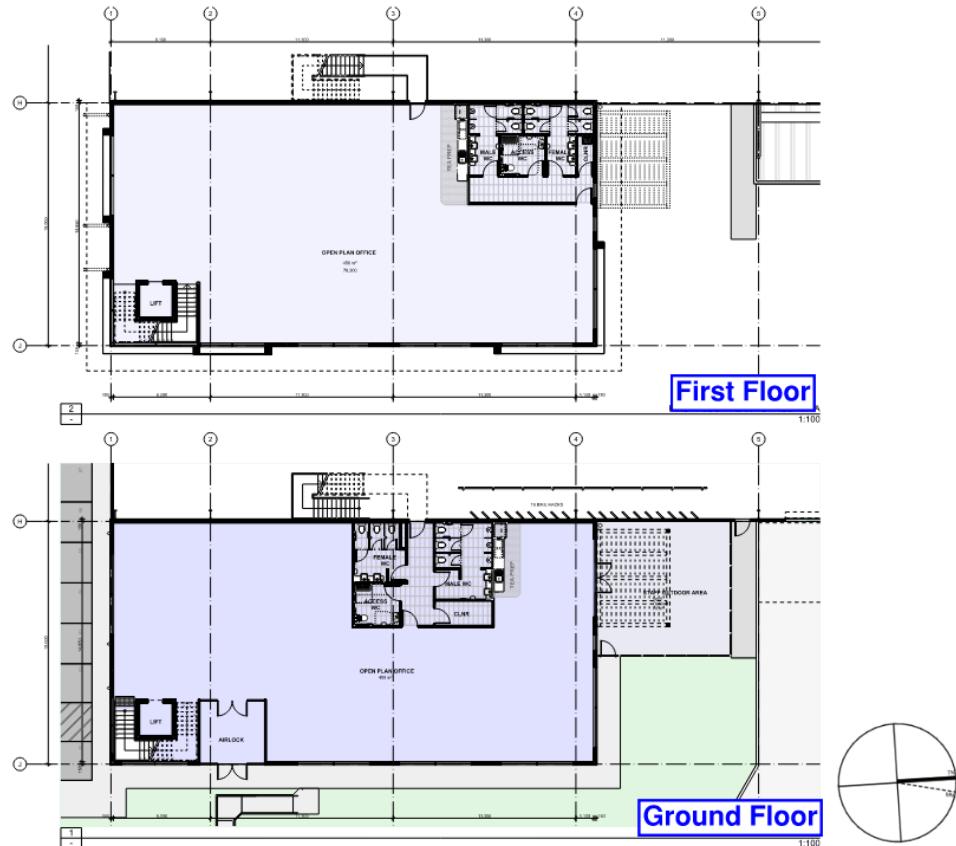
WH4A Office Plan – Ground Floor (Bottom) & First Floor (Top)
